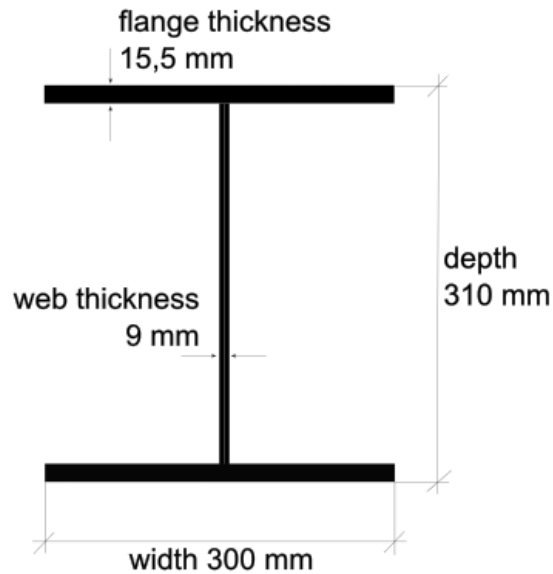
Cross-section of an H-shaped HEA 320 beam.
